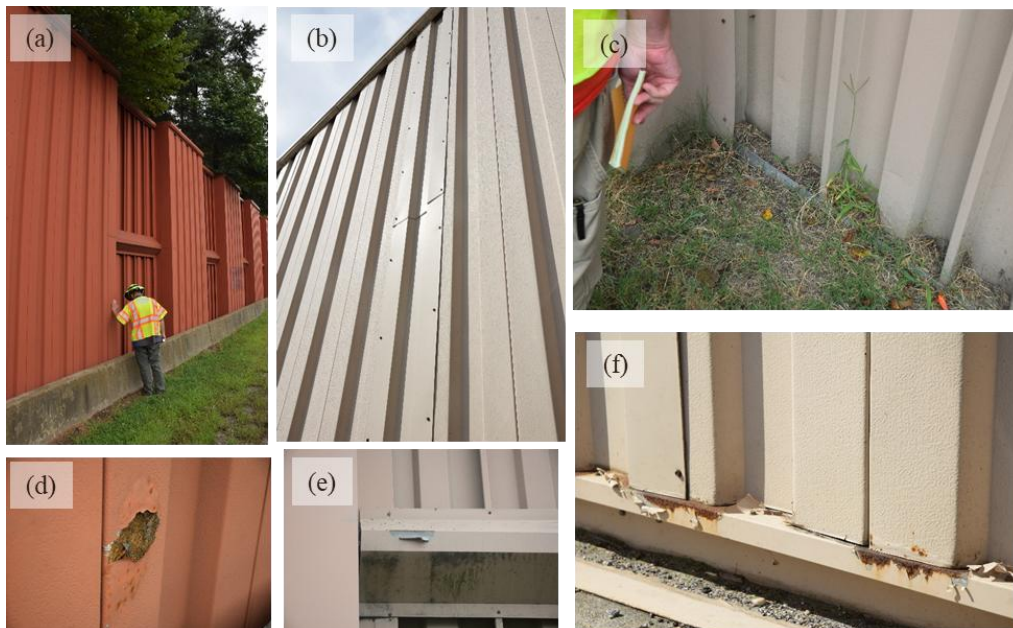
Photos of the Condition of Noise Barriers Constructed with Metal Panels Oriented Vertically: (a) Overall Condition of Ground-Mounted Barriers; (b) Overall Condition of Bridge-Mounted Barriers; (c) Susceptibility to Corrosion if Ponding Were to Occur; (d) Minor Section Loss at Intermittent Locations; (e) Minor Coating Failure at Intermittent Locations; (f) Corrosion Damage at Base and Flashing of Bridge-Mounted Barriers
